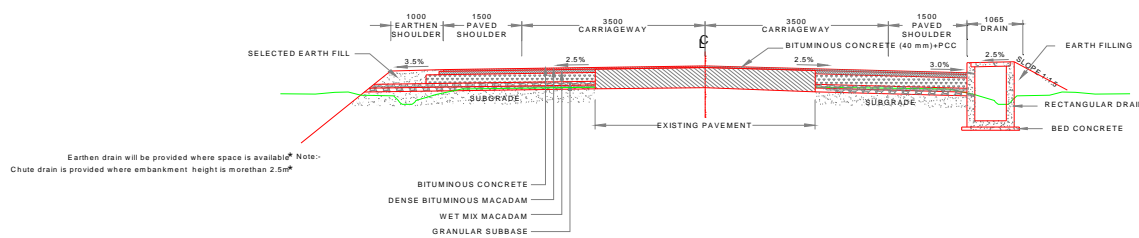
TYPICAL CROSS SECTION- TYPE-7
